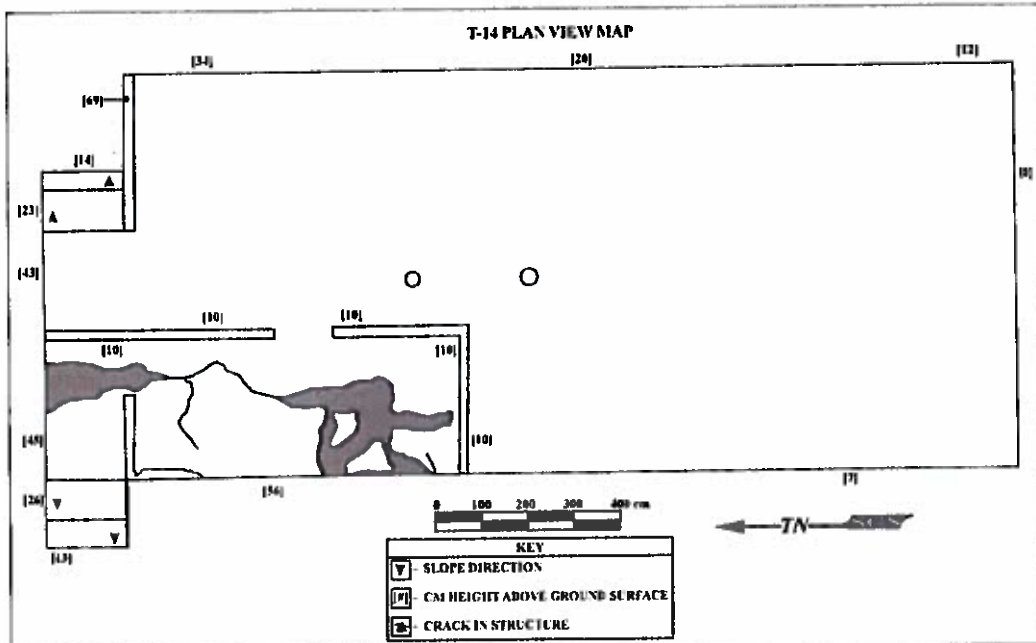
Plan View Drawing of SCS Site T-14 Foundation.
